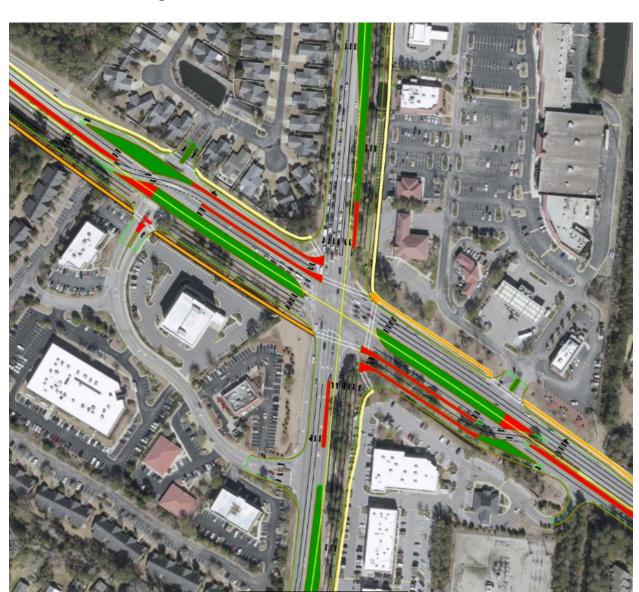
Geometric Layout of CFI along Eastwood Road.
